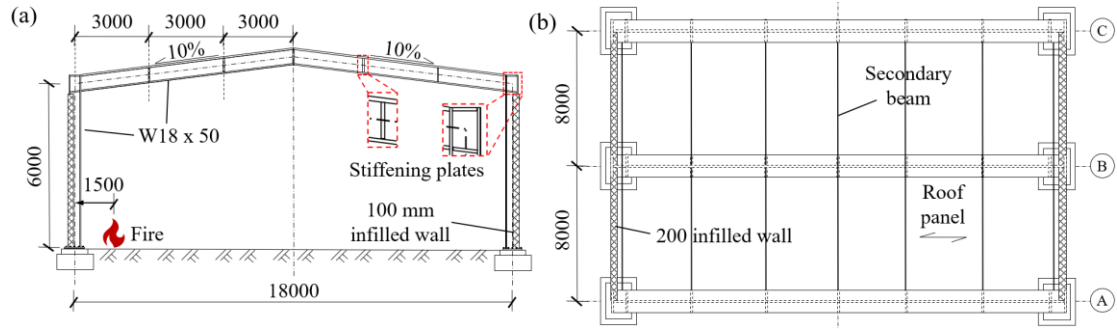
(a) Elevation view along Grid Line B and (b) plan view of a typical single-story factory building exposed to a local fire (unit: mm).
